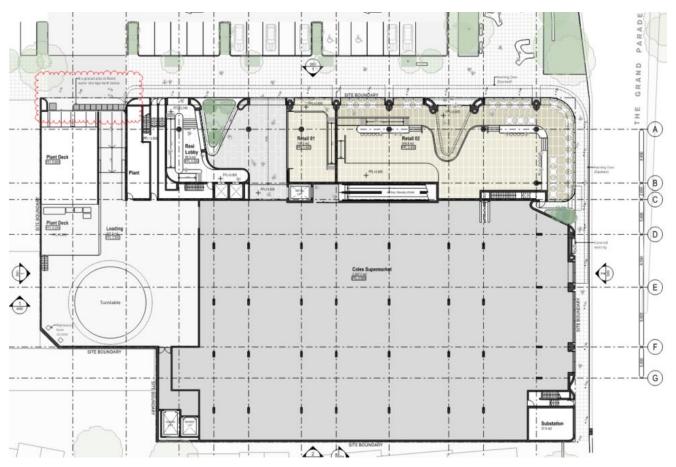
Proposed Ground Floor Plan (Source: FJCStudio - 2000 [05])
